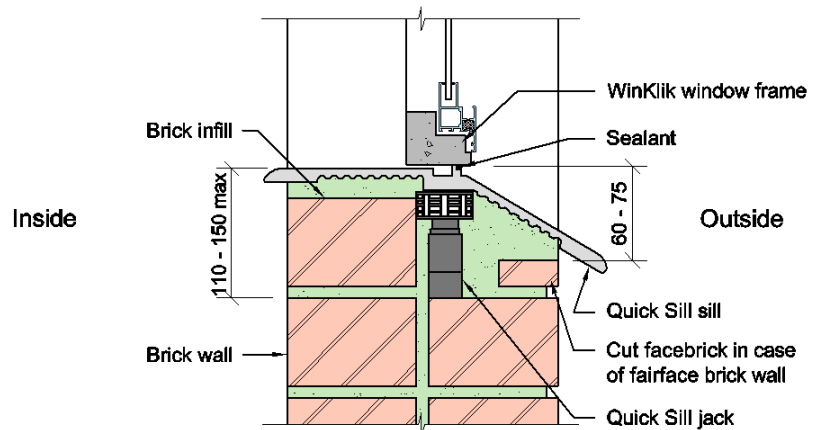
Typical elevation and section through window frame (without aluminium sashes)
